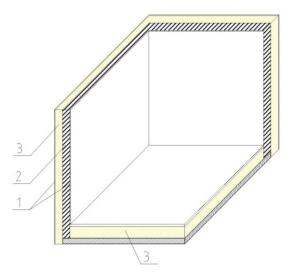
Option 2 of insulation joint between the wall and basement floor.
